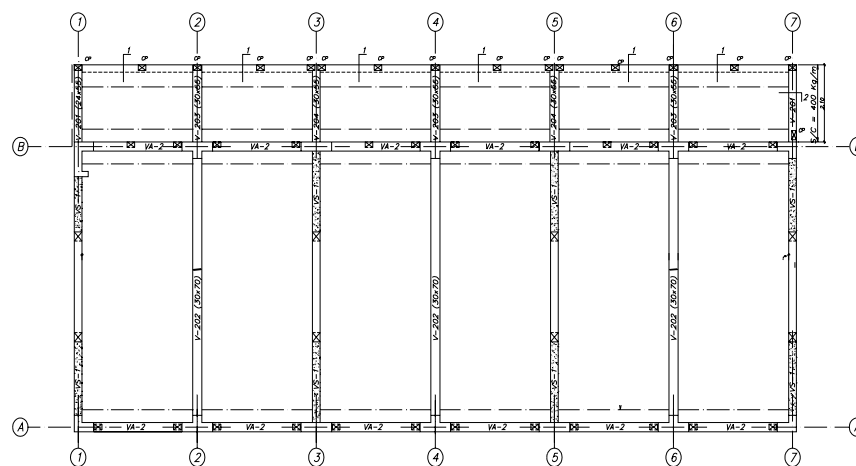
Typical school structure plan: Two or Three stories. Reinforced masonry in one direction. Wide concrete columns (small shear walls) in the other.
